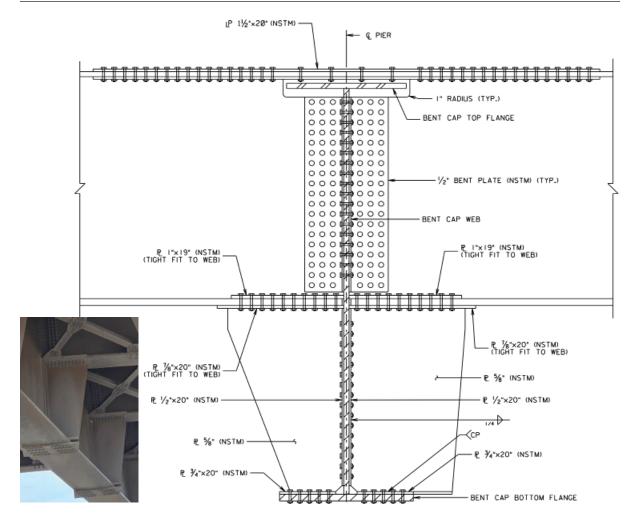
Single girder bent cap—integral, corbel connection 2.3.4—End Plate and End Angle Framing
